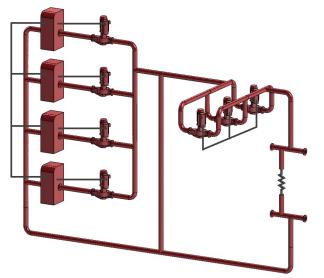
DESIGN ENVELOPE PLANT LAYOUT.
